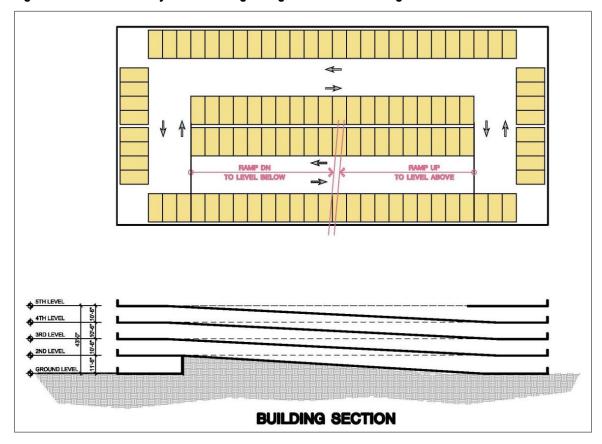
Potential Layout of Parking Garage at Livermore Village Site
